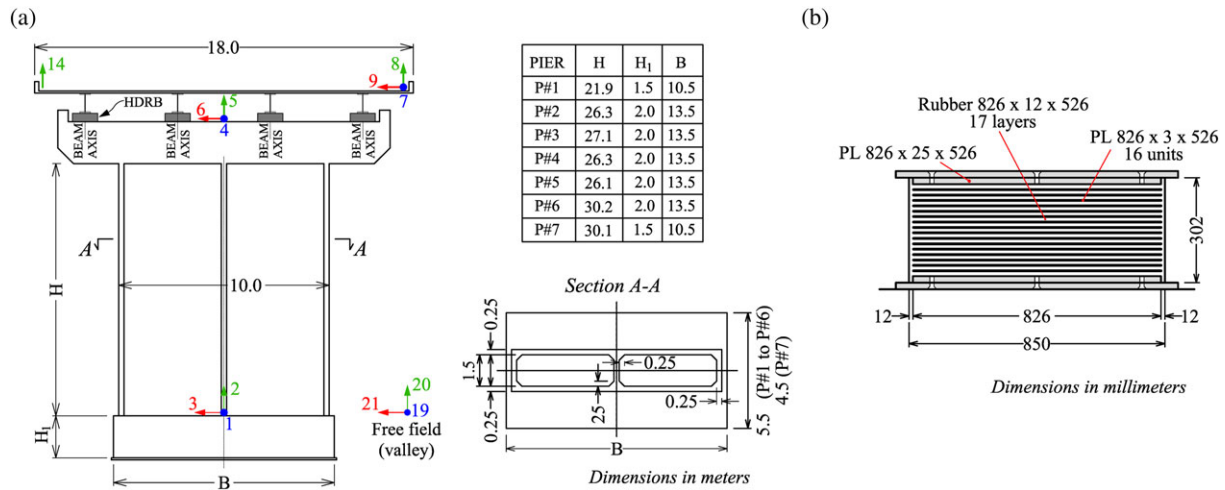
(a) Pier columns and instrumentation, and (b) HDRB (seismic isolator) on bridge piers. HDRB, high-damping rubber bearing [Colour figure can be viewed at wileyonlinelibrary.com]
